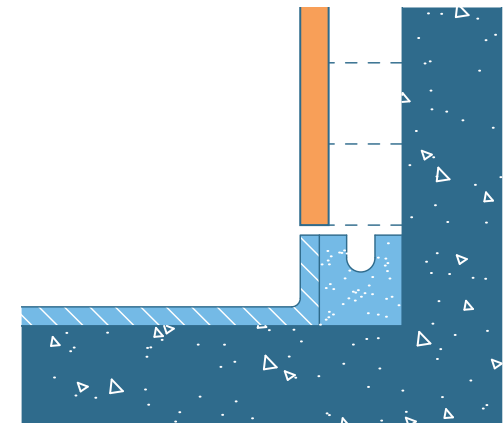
Drainage channel in areas of water ingress, concealed behind wall finishes, but easily accessed
